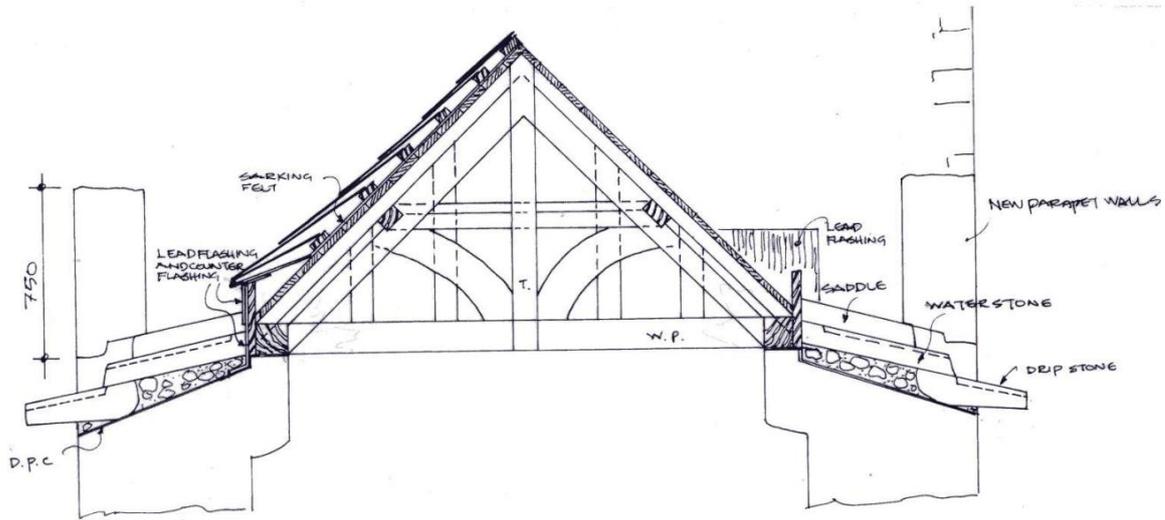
Roof restoration drawing illustrating roof & drainage components – (Stapleton, 1999)
